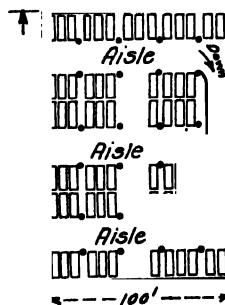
Floor plan garage 100 ft. by 150 ft. with straight ramp.
